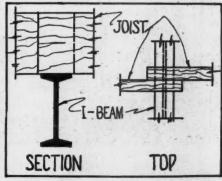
Wood Joist Resting on Top of Steel Beam. The joists are lapped and fastened together with a few nails.
